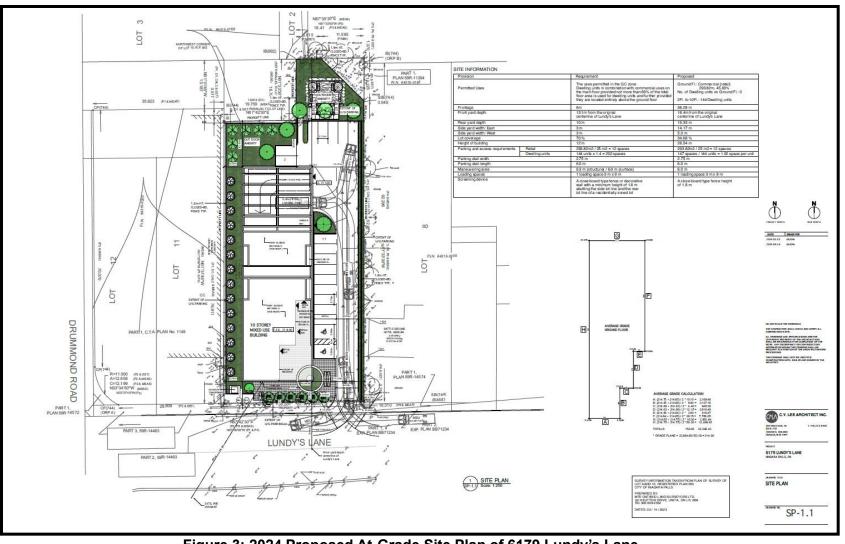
2024 Proposed At-Grade Site Plan of 6179 Lundy's Lane (CY Lee Architects Ltd. 2024a)
